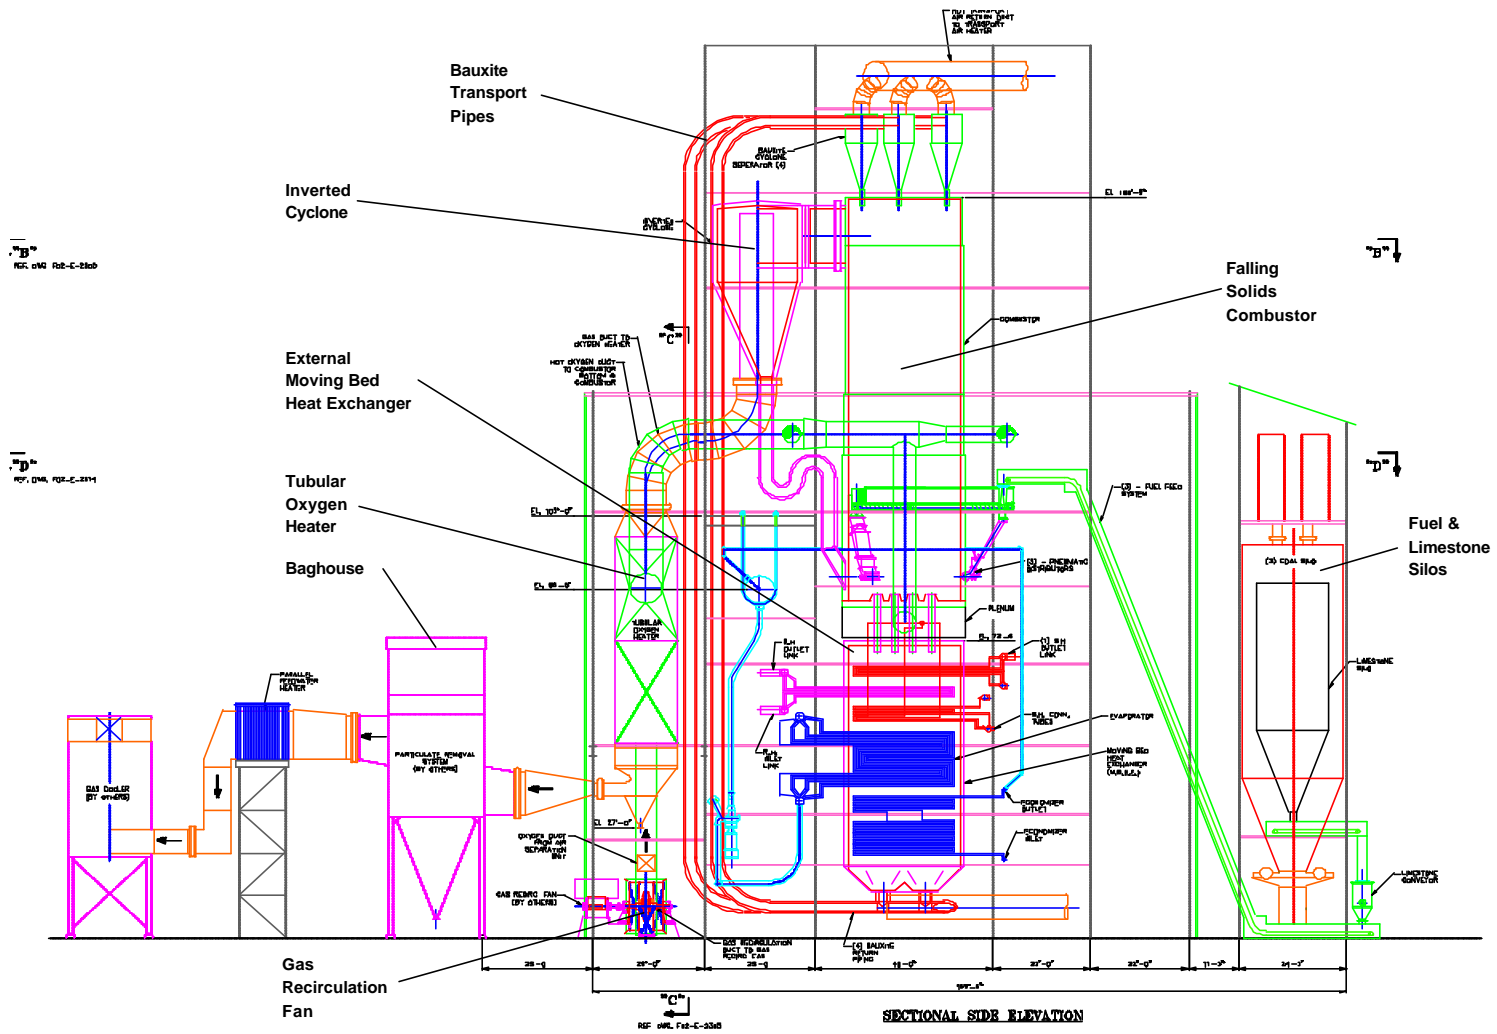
2: Case-4 Boiler Island General Arrangement Drawing – Side Elevation
